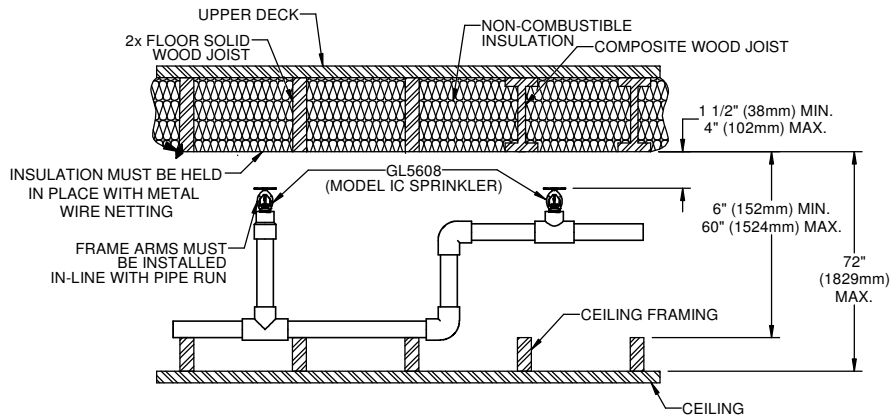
STEEL PIPE NON-COMBUSTIBLE INSULATION FILLED UPPER DECK SOLID WOOD OR COMPOSITE WOOD JOIST CONSTRUCTION
